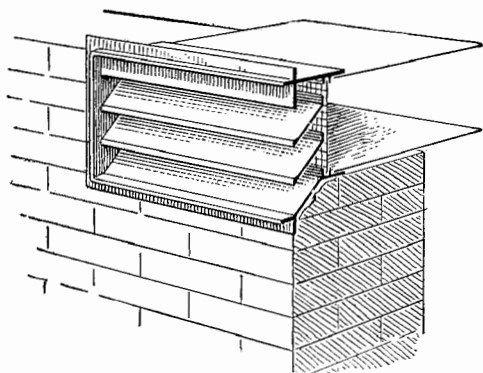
Cast Iron Wall Box with Louvres and Netting
